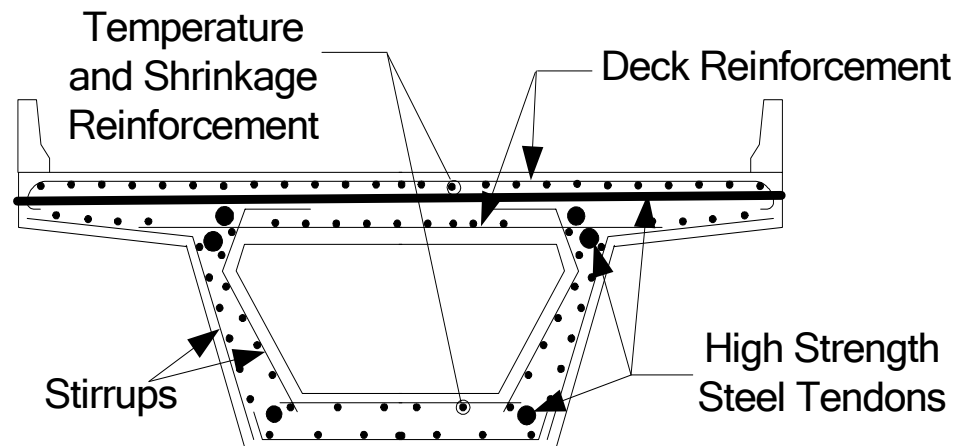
Primary and Secondary Reinforcement in a Concrete Box Girder
